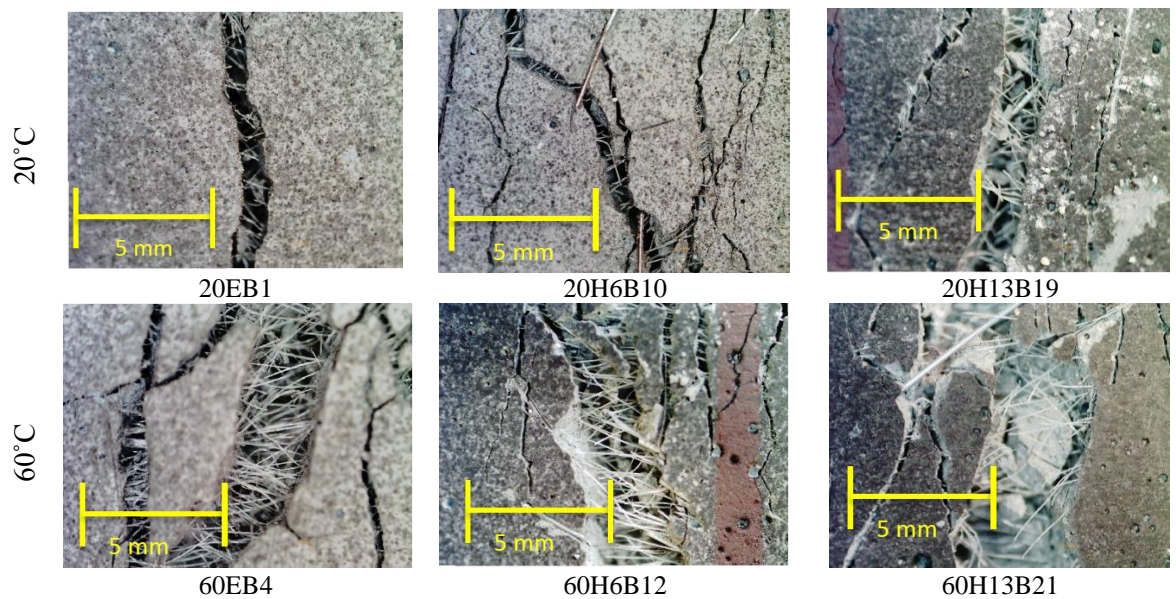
Failure crack patterns at bending test along 40mm of central span
